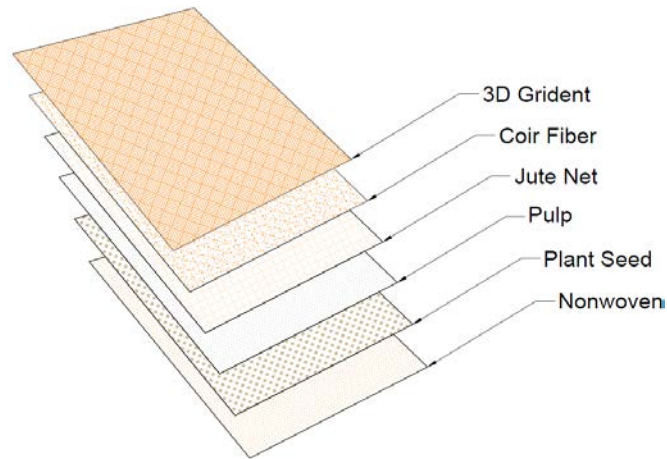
Geotextile-vegetation mats, non-woven geotextile (Adopted from BuyKorea (2017))
